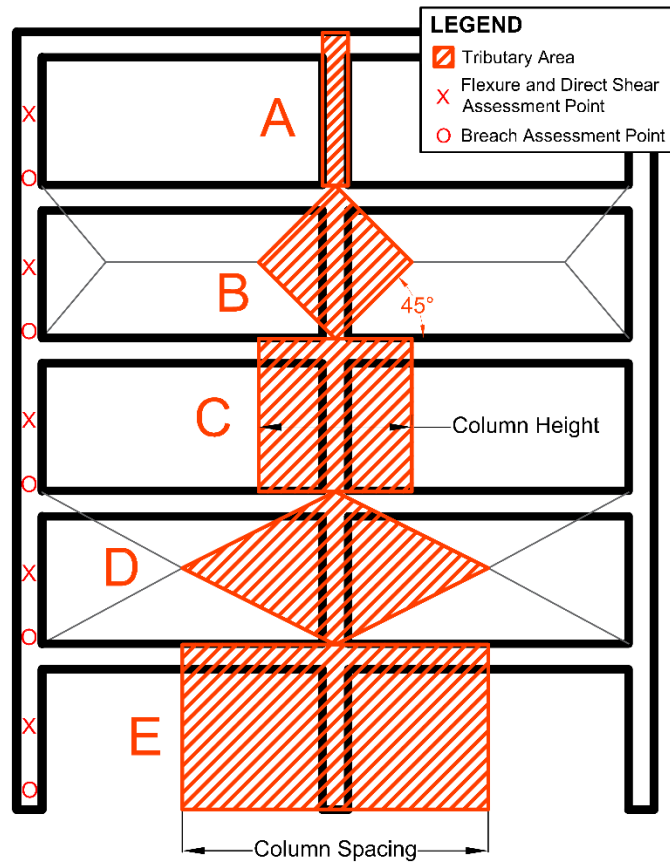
Elevation view of a building frame showing possible column tributary area geometries (A-E) and damage assessment locations
